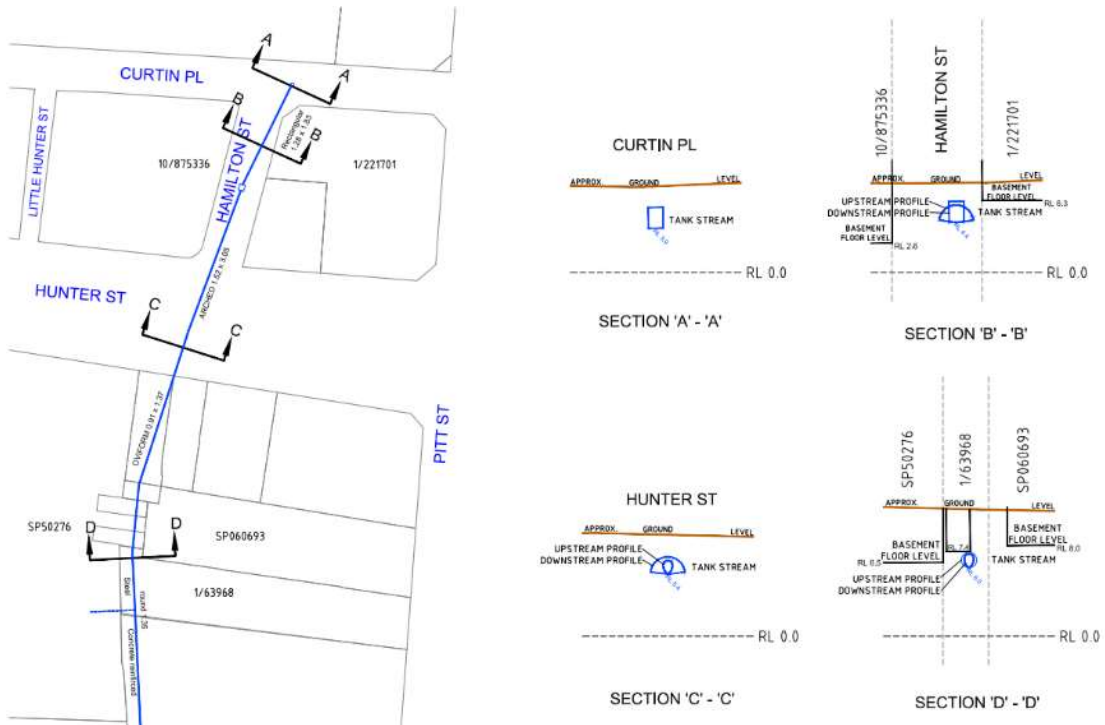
Diagram illustrating the Tank Stream tunnel profiles in the vicinity of Hunter Street West as surveyed by SAS TTI JV in 2021. Source: Tank Stream Cross-Sections, RPS, December 2021
